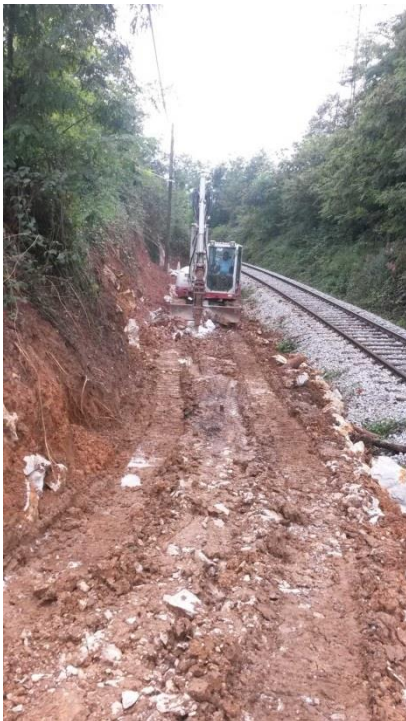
EARTH WORKS AT THE CONSTRUCTION SITE
